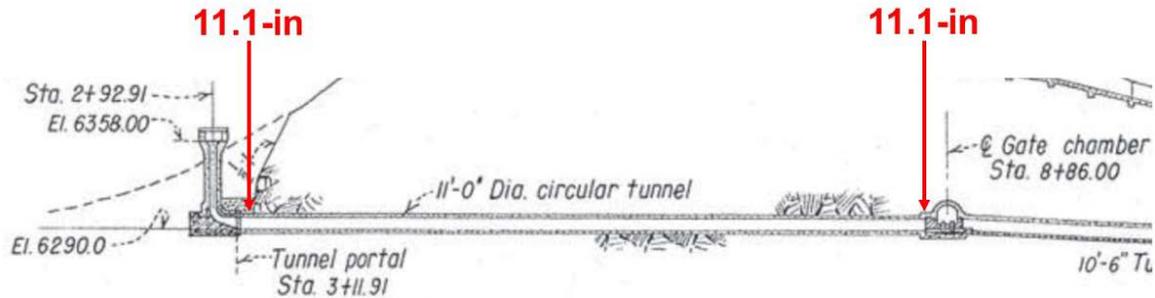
Locations for two 11.1-in air vents installed on the Paonia outlet tunnel model.
